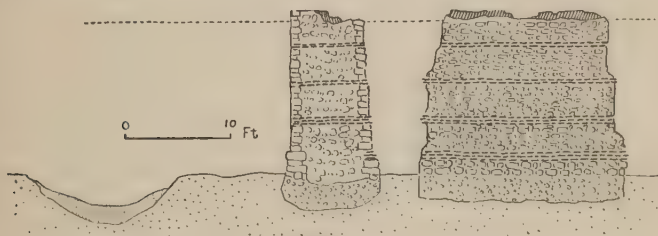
TOWN WALL OF LONDINIUM, WITH DITCH
